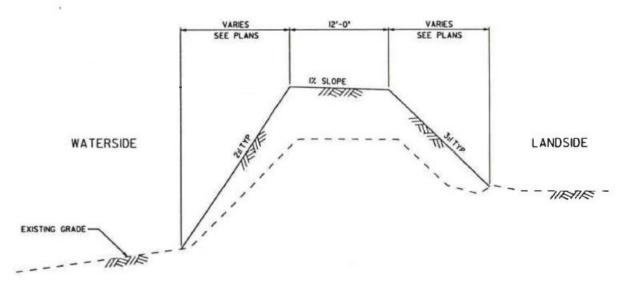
Typical MCDC Levee Embankment Improvement Cross-Section
